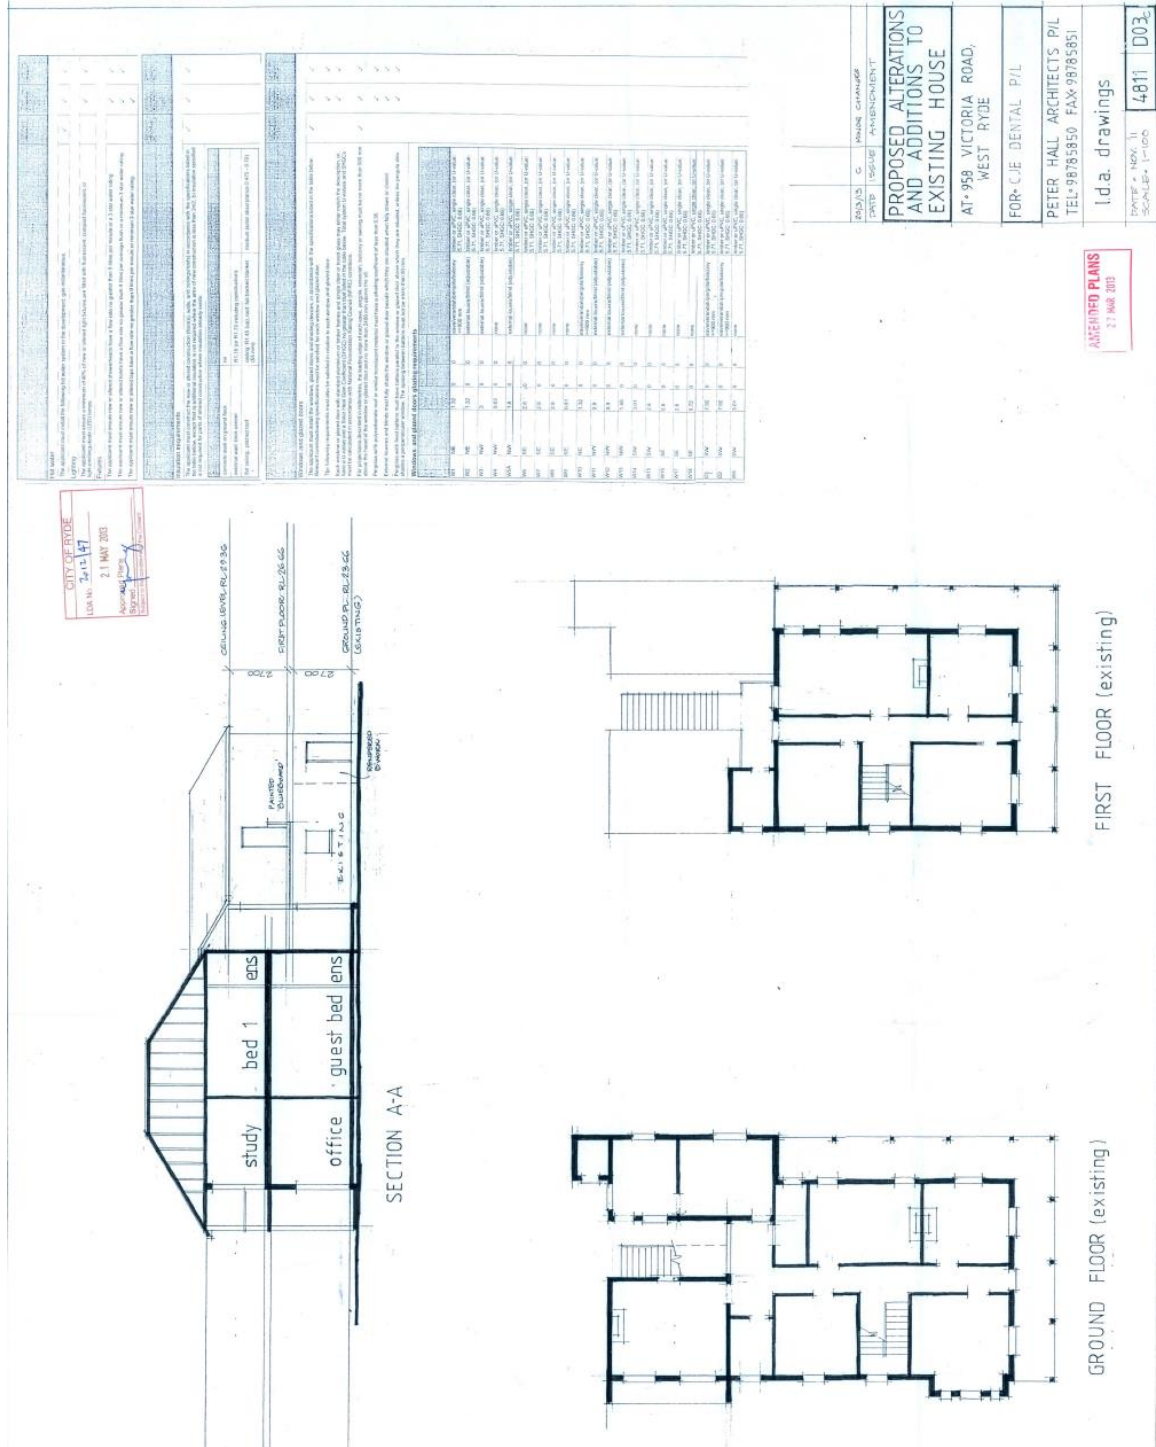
Approved DA plans under LDA2012/0047 showing existing layout of premises.
